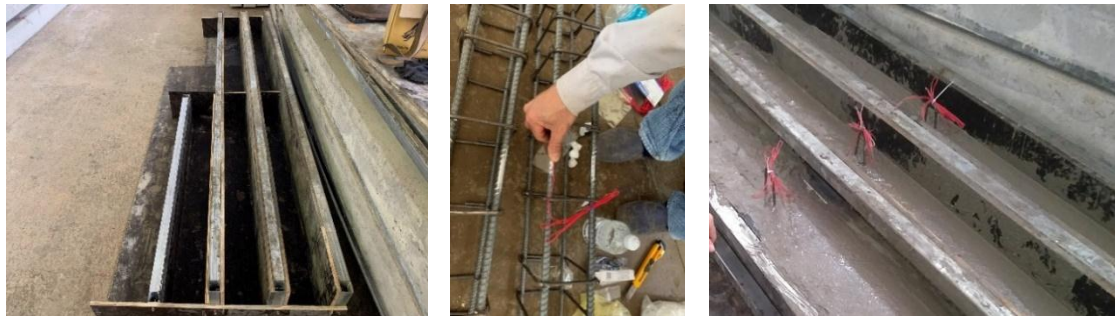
Fabrication of RC beams (150 × 200 × 1400 mm).
